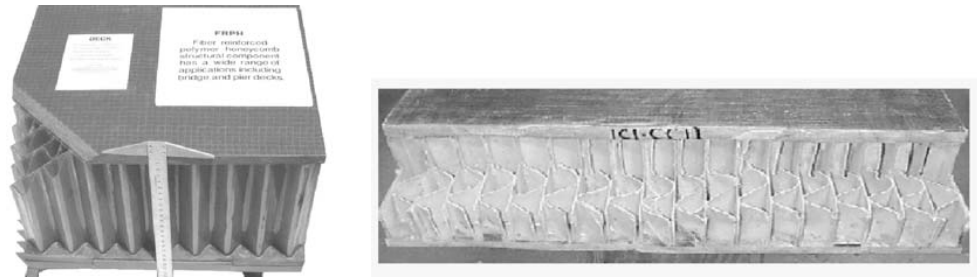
Honeycomb sandwich configuration (Photograph from NCHRP Report 564 – Field Inspection of In-Service FRP Bridge Decks)
